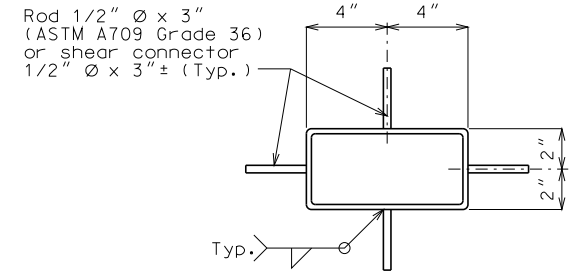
DETAILS OF DRAINS TRANSVERSE TO ROADWAY
